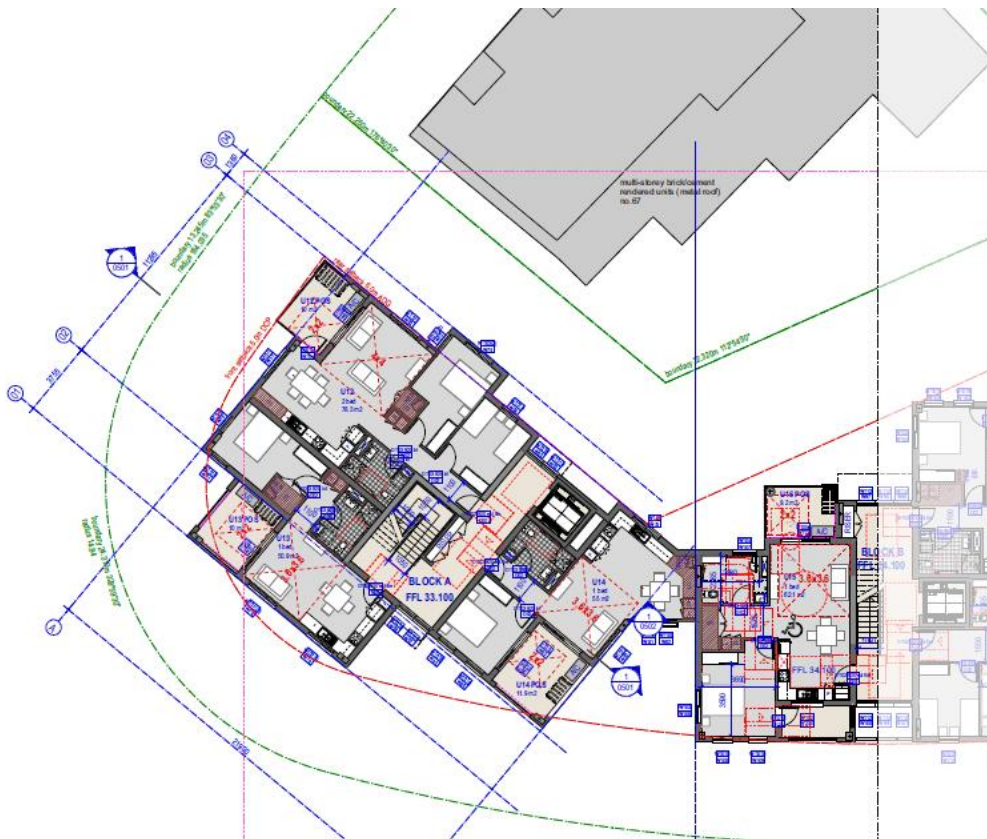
Extract from Architectural Plans – Level 02- Part 1 (Source: Architectural Plans, Kennedy Associates Architects, dated 29/08/2024)
